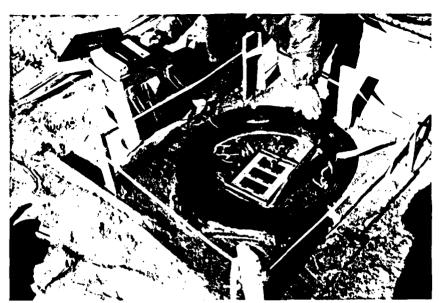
MANHOLE RING IN PLACE AND READING THERMOCOUPLES USING DIGITAL READOUT UNIT
